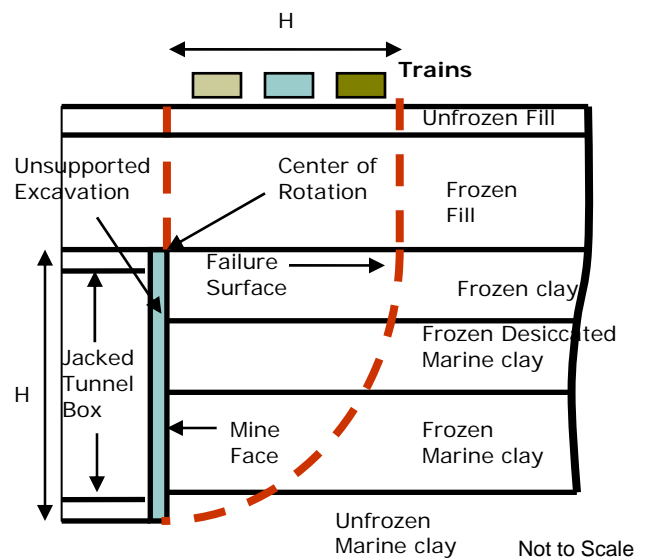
Typical Cross Section Showing 2-D Plane Strain Failure Surface and Center of Rotation
